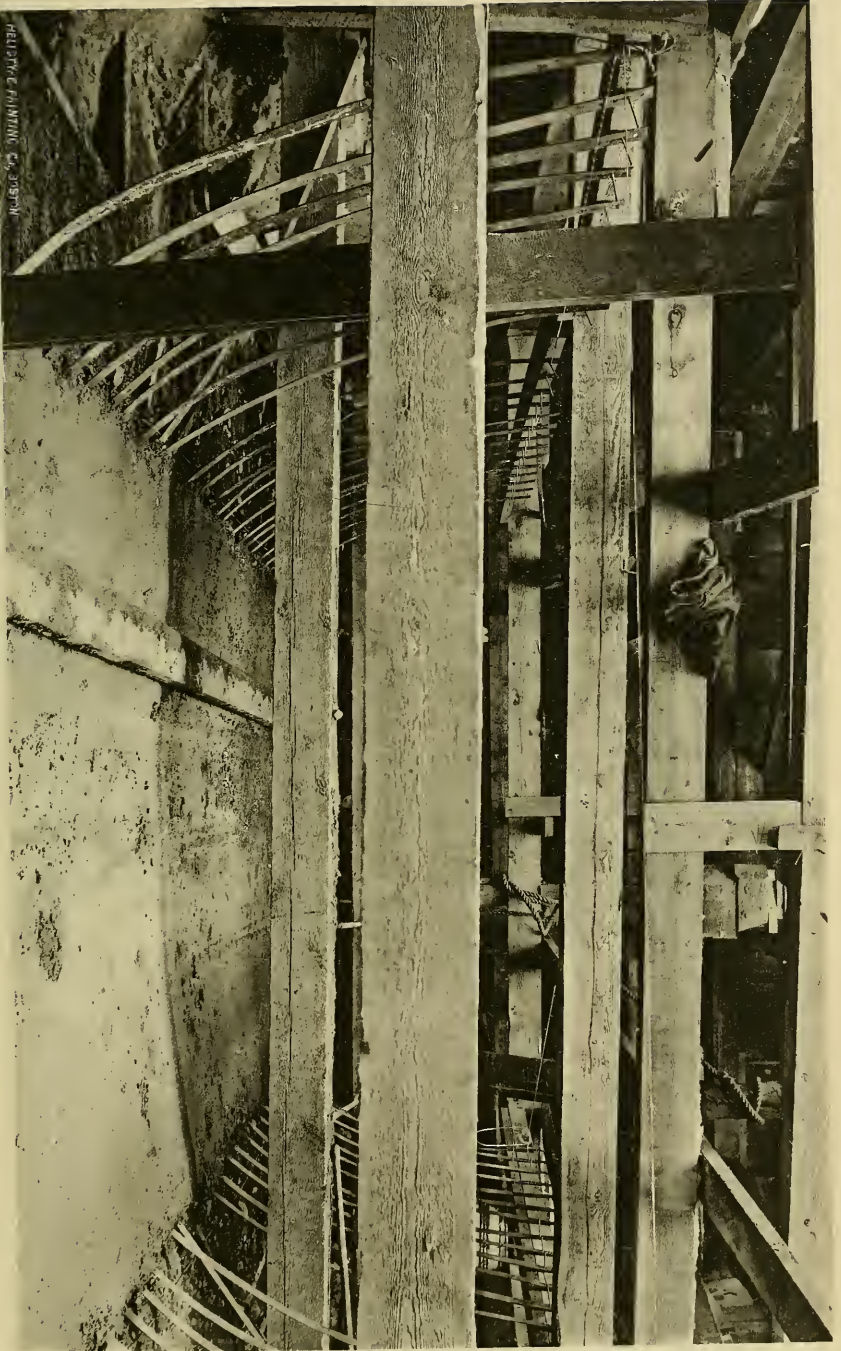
SECTION 2, BOSTON COMMON, TREMONT-STREET MALL. STEEL HOOPS IN WATER-PIPE CONDUIT. January 22, 1896.
